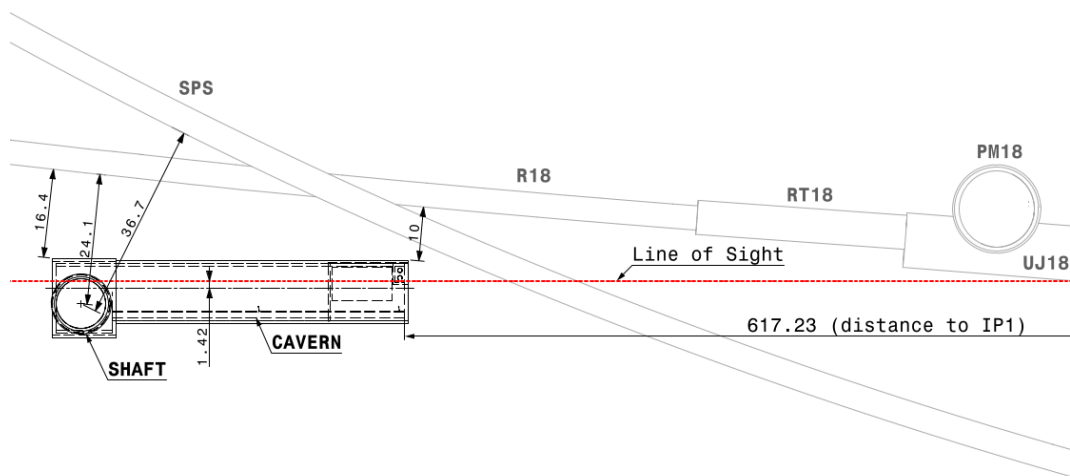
Situation plan of the underground facility with the proposed safety corridor inside the cavern
